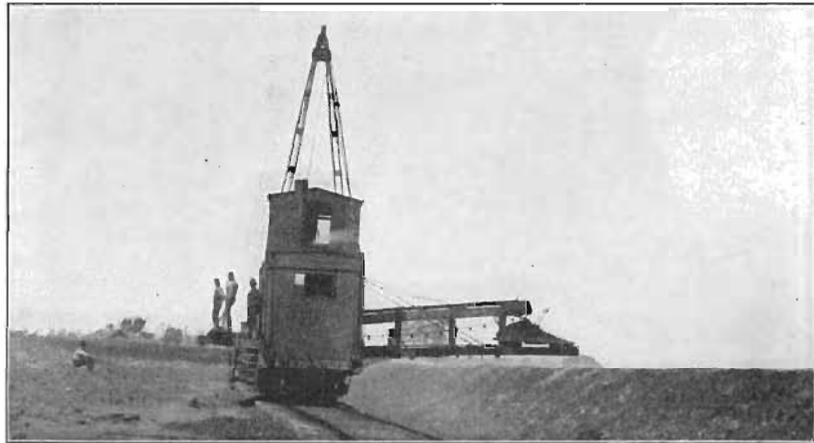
Coaling machine used by the Davy Burnt Clay Ballast Company.
